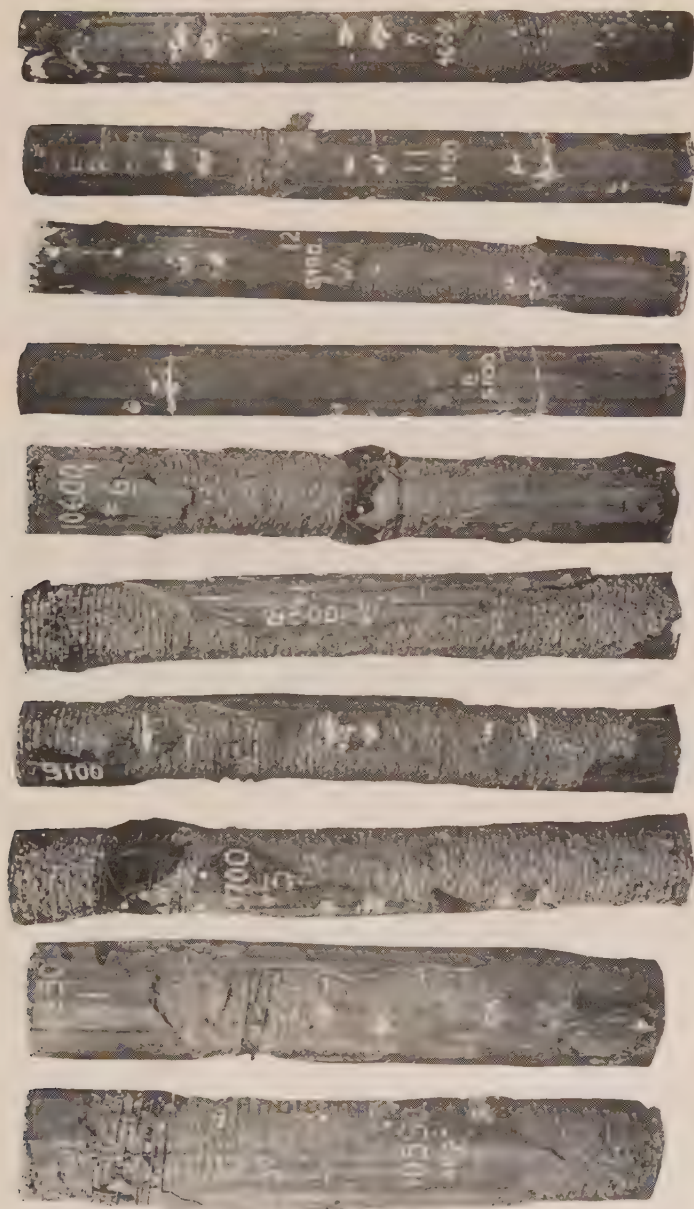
SOME OF THE CAST-IRON CORED CONCRETE COLUMNS AFTER FAILURE.
